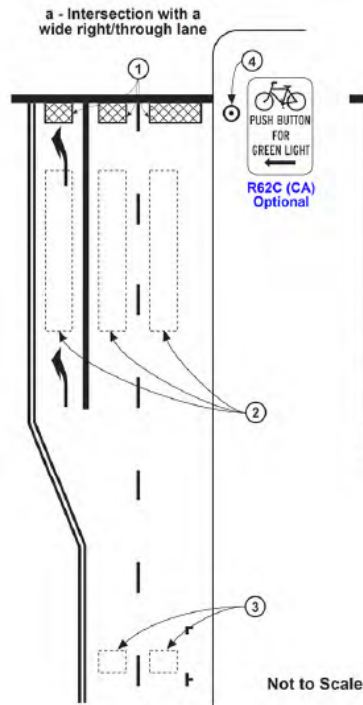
Typical Layout of Intersection Approach without On-Street Bicycle Lane (Caltrans, 2014)
